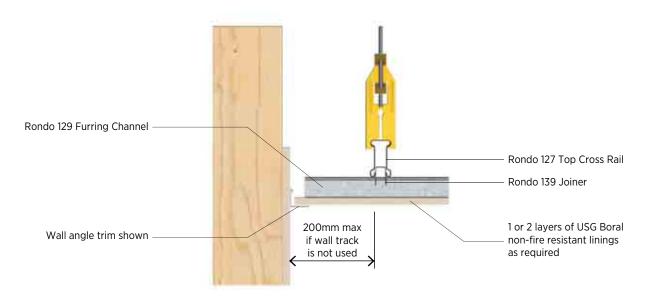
Typical Perimeter Detail - Section Through Top Cross Rail
